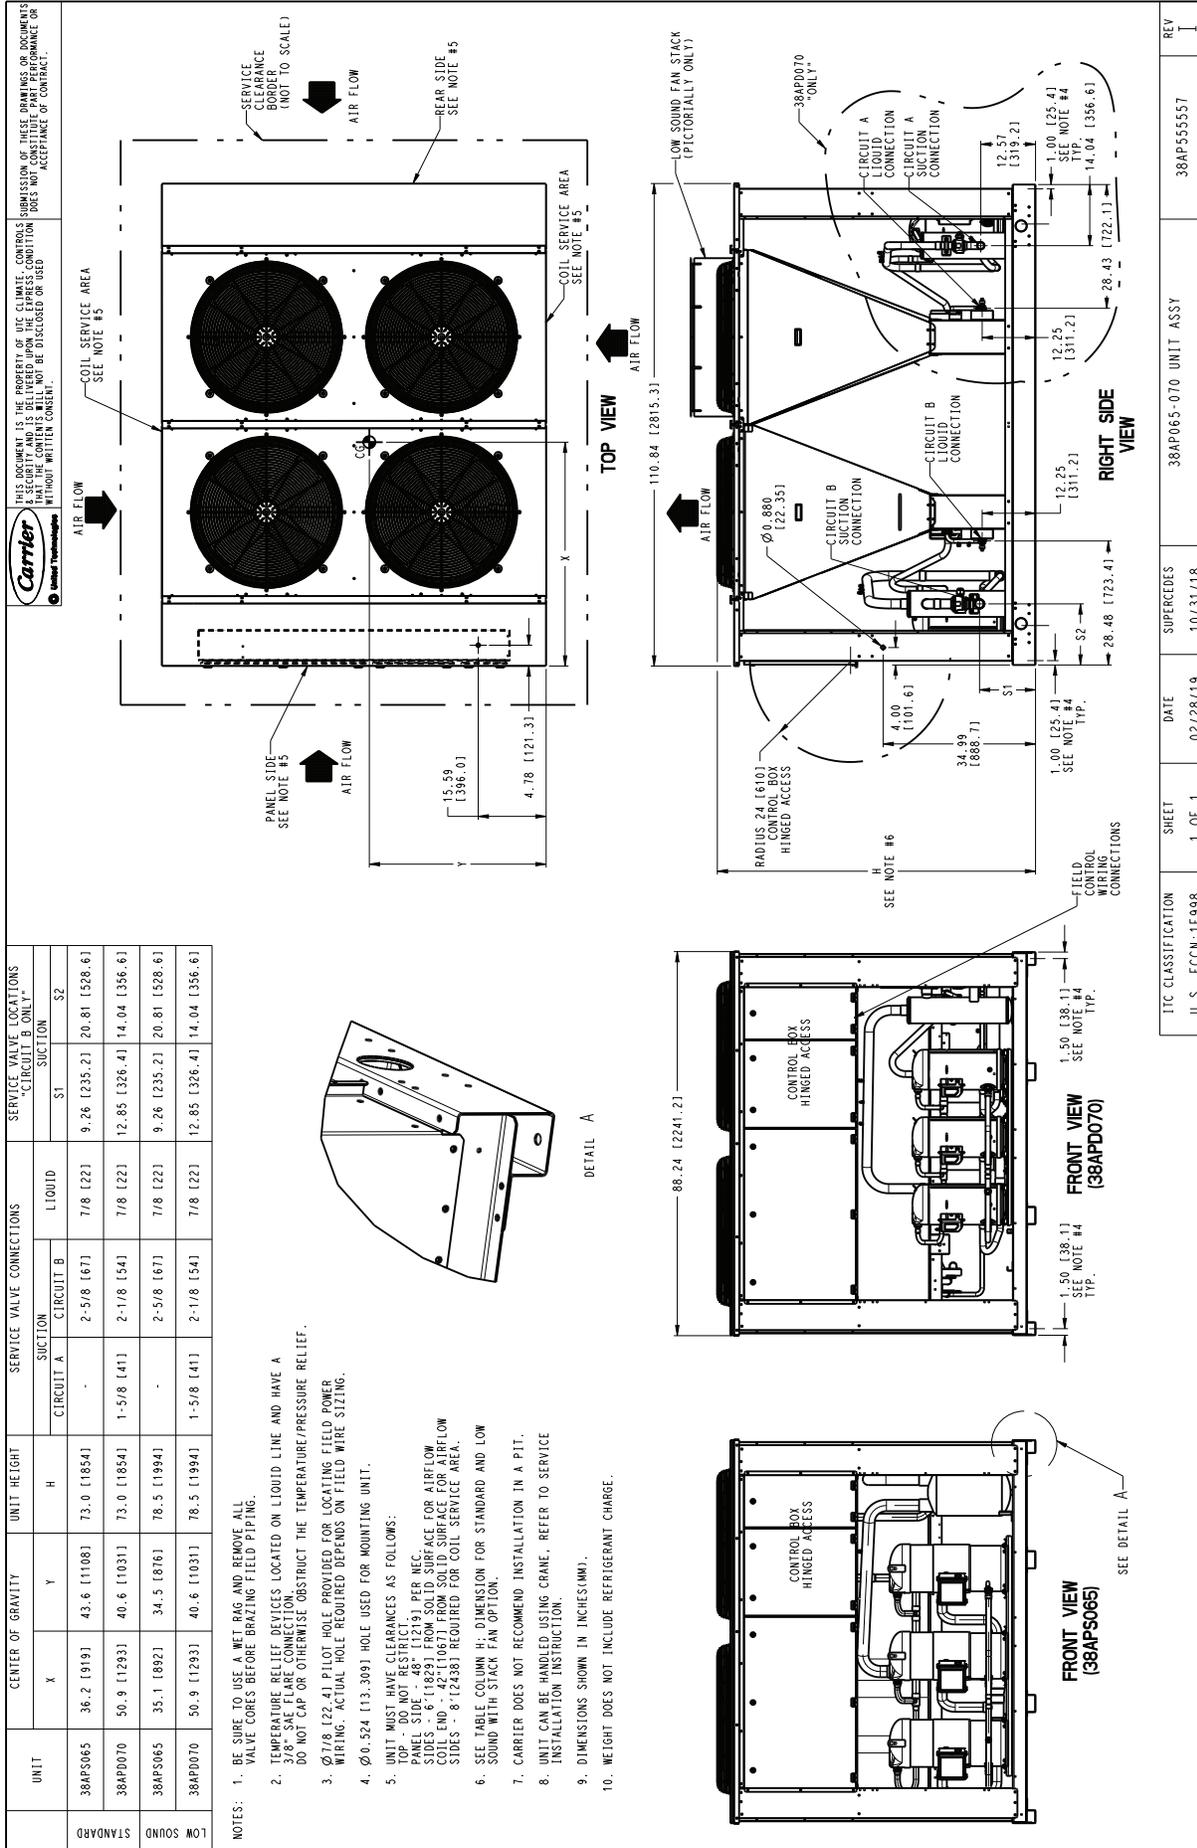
38AP Unit Dimensions, Sizes 065 and 070
